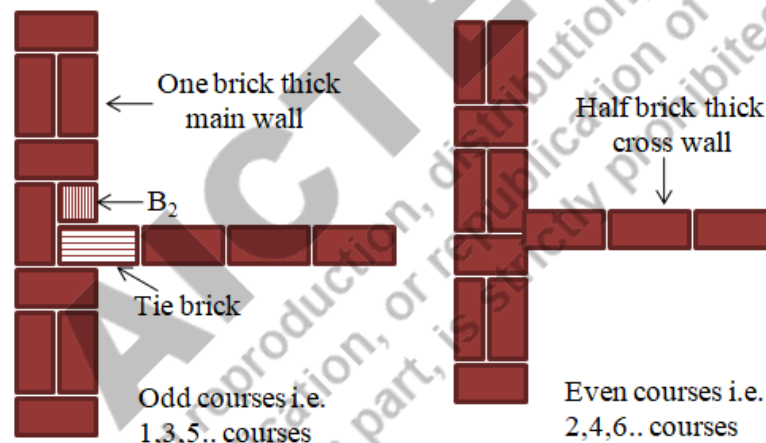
(a) Tee junction between one brick thick wall and half brick thick wall in Flemish bond
